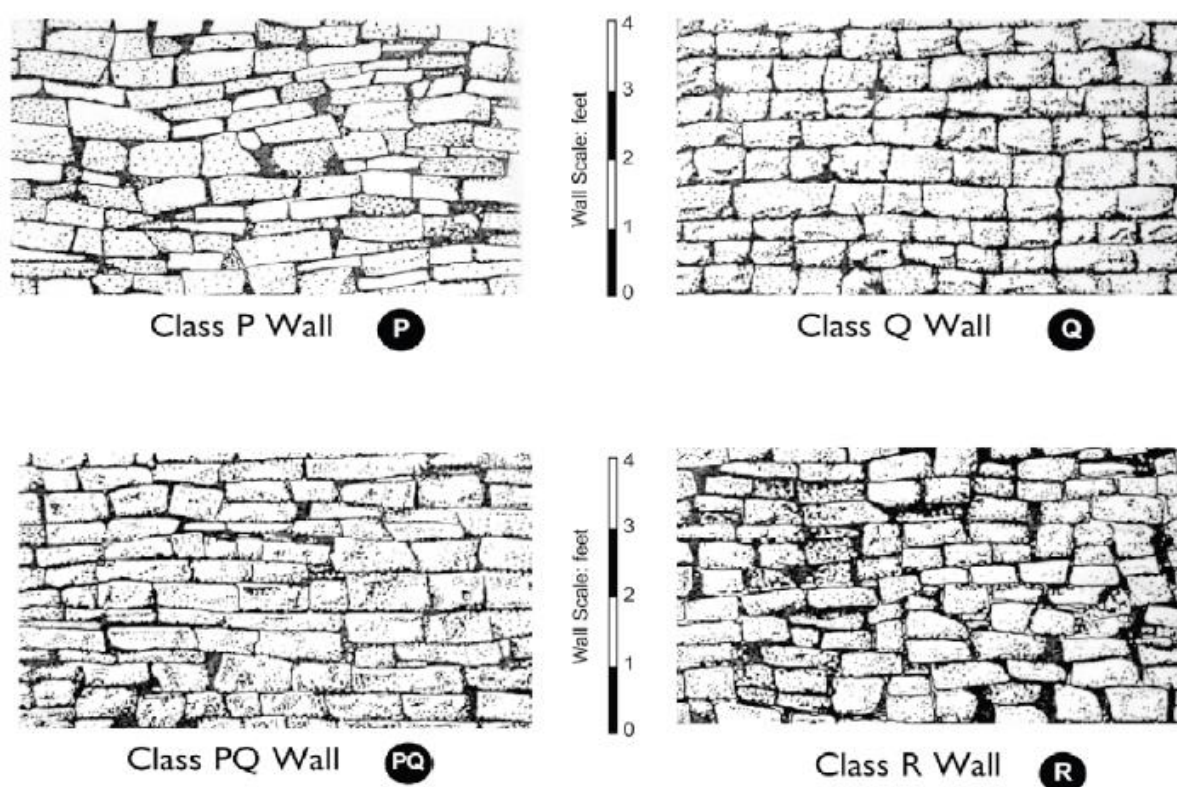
7: Schematic styles of dry stone walling (Adapted from Whitty 1961:293 and Chirikure & Pikirayi 2008:981)
